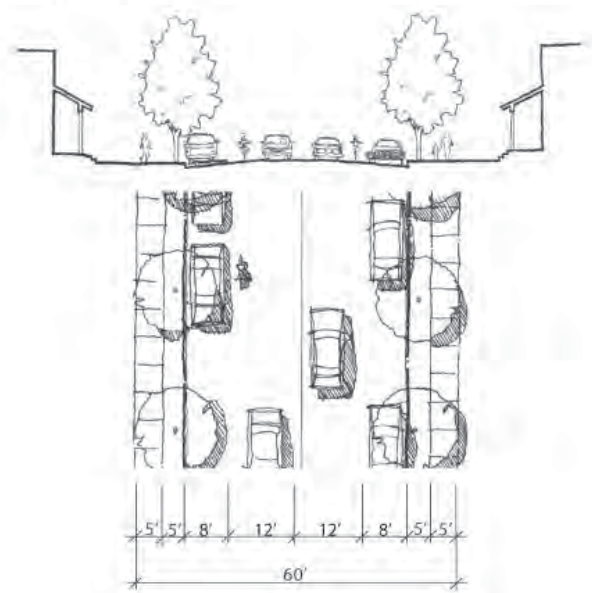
G - STREET SECTIONS - FORD BOULEVARD
